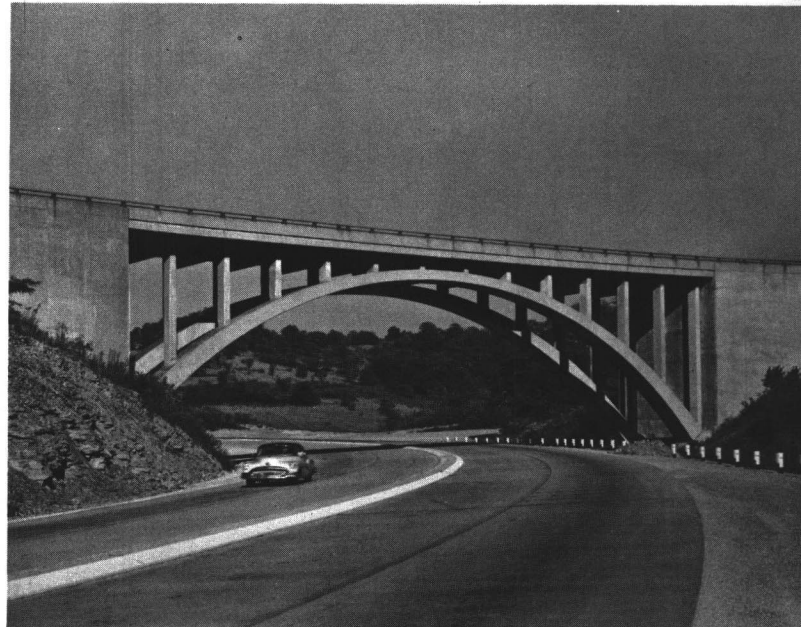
Maximum driving safety is provided by carrying the full roadway width, including shoulders, under structures on the Dallas Central Expressway. Design: Texas State Highway Department. Construction: Austin Bridge Co., Dallas, Texas.
